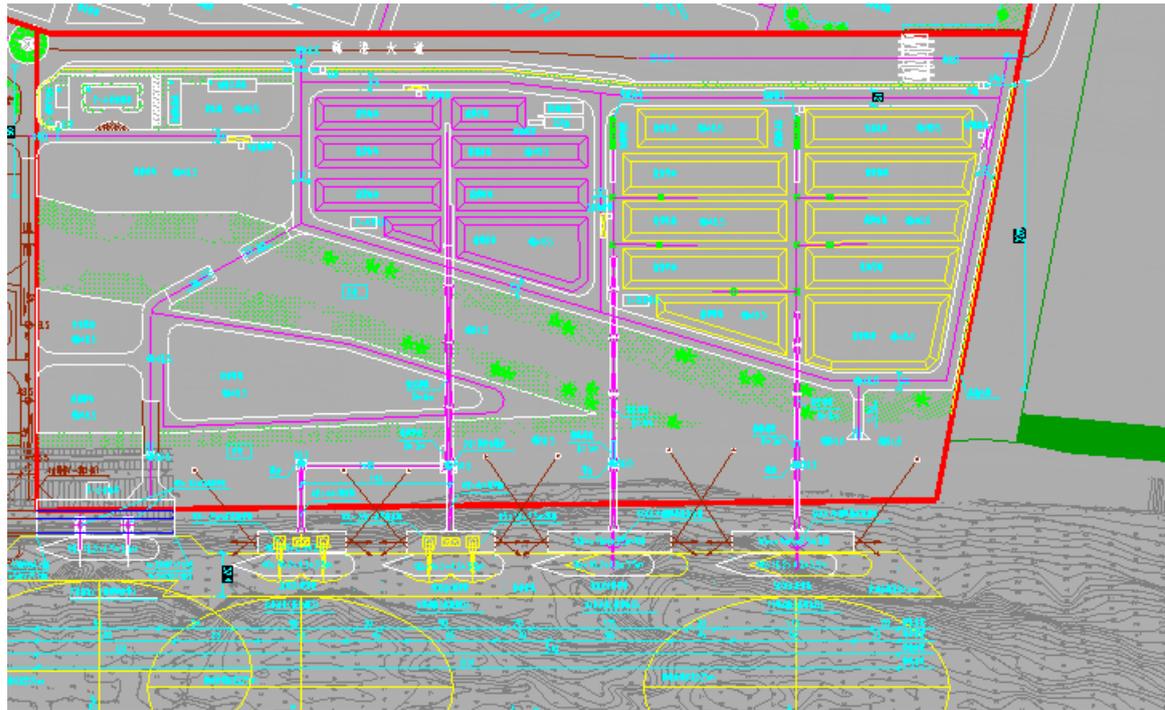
Layout plan of # 7 ~ # 11 Berths (Scheme I)
